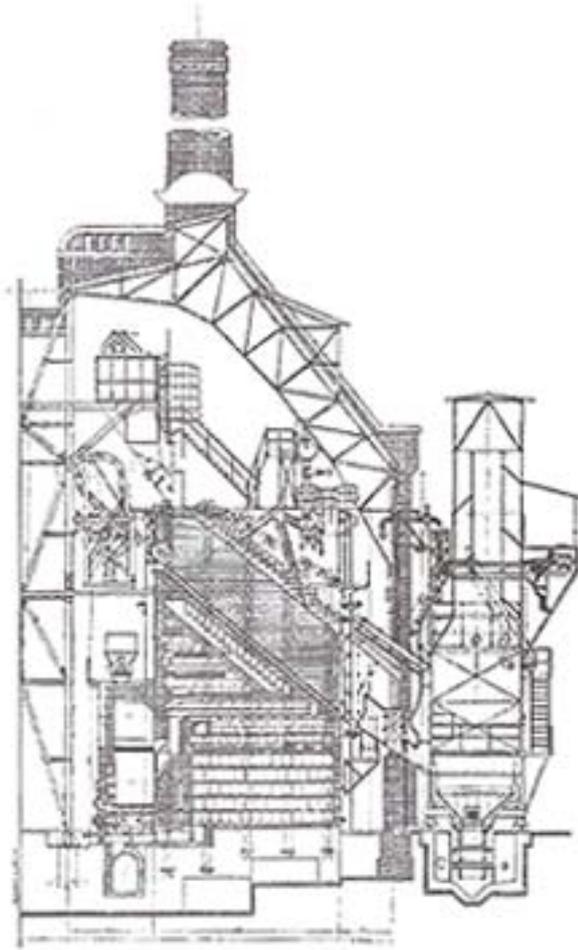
A drawing of the furnaces, drawn by Didier Co.
